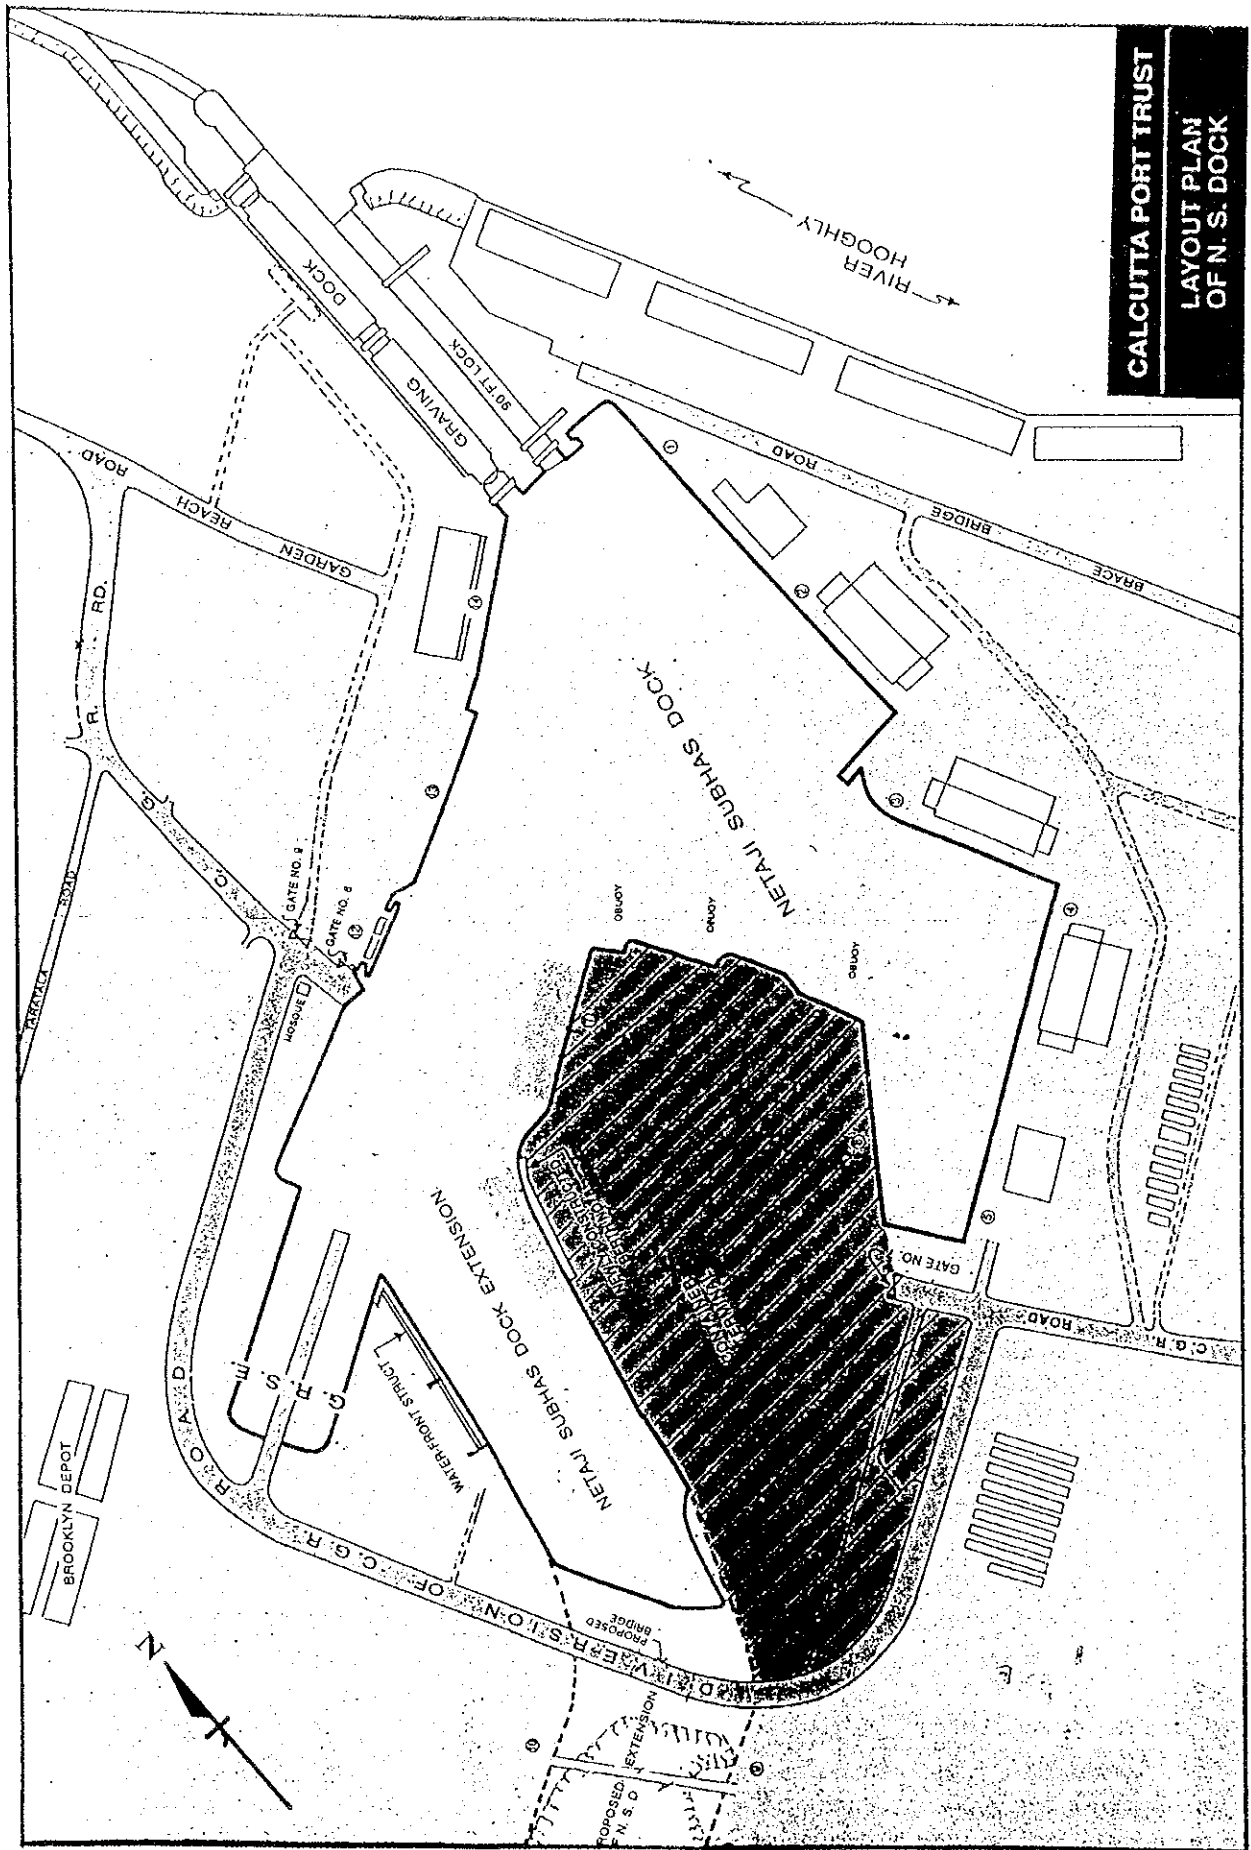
Layout Plan of Netaji Subash Dock at Calcutta Port
